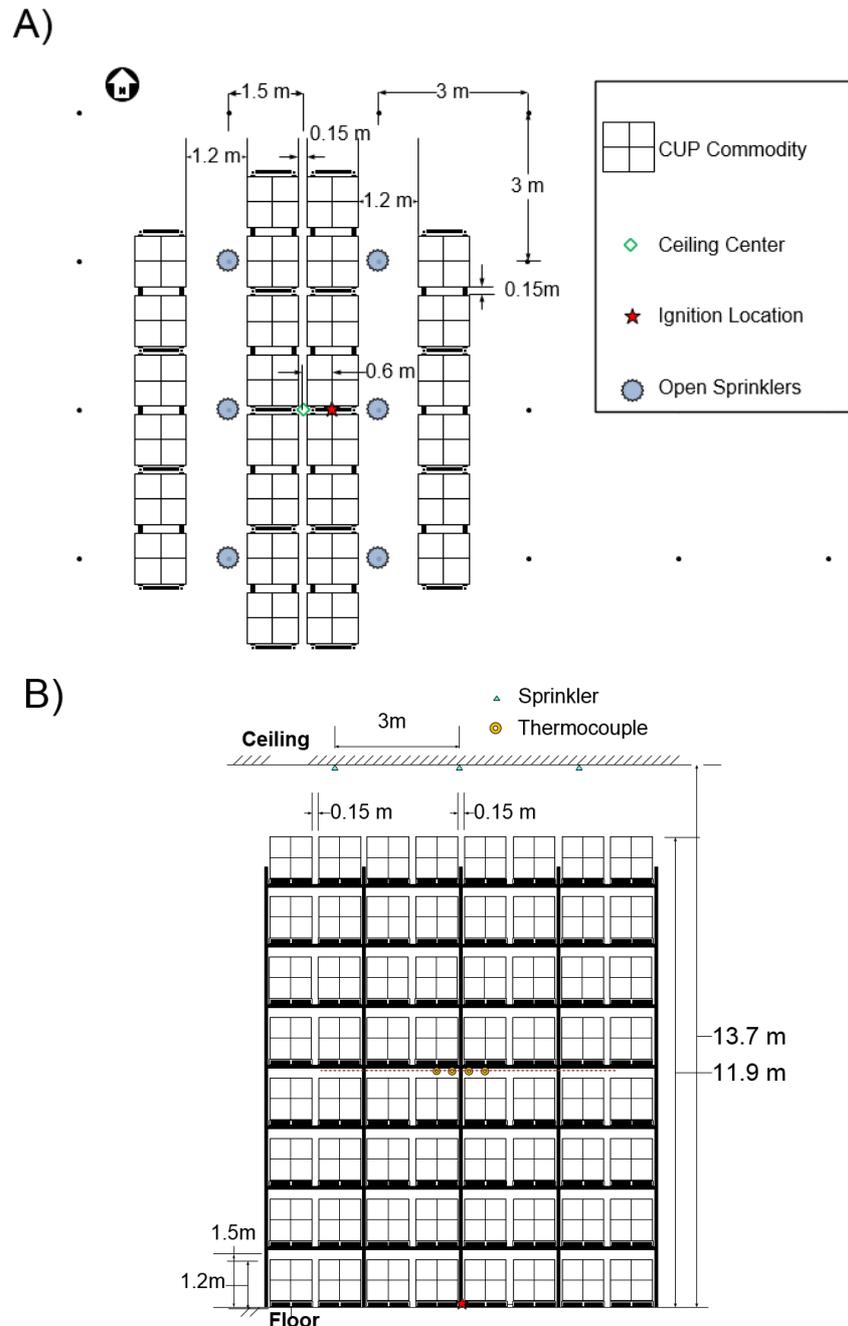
a) Plan view of proposed test setup, utilizing a “between 2” configuration. b) Elevation view of main array used for Test 1: 8 tiers of CUP storage under a 13.7m ceiling.
